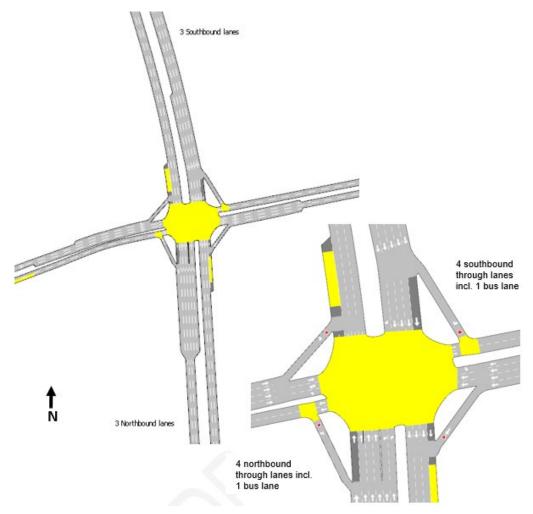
Assumed upgrades at Richmond Road and Townson Road (2036)
